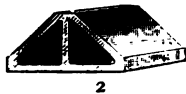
, so as to form a corrugated surface, each trough or girder being 1 ft. 6 in. wide.
